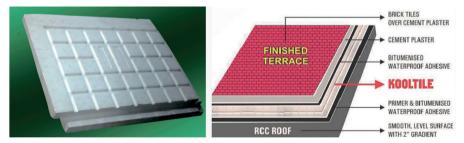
Insulated EPS deck and section with interlocking arrangement for airtight insulation (Agarwal & Kamal, 2023).
